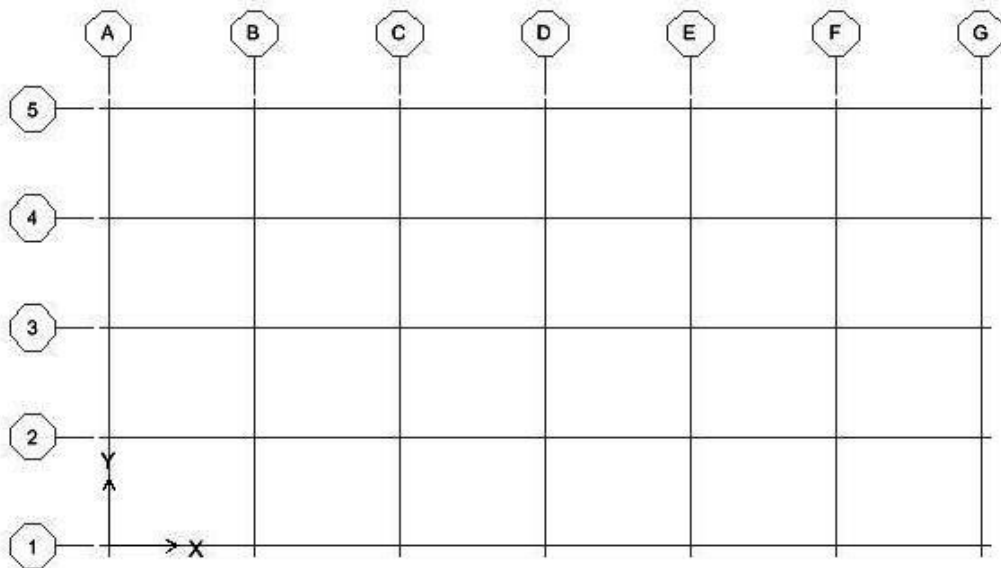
PLAN VIEW FOR 5, 8 & 12 STOREY R/C FRAME BUILDING
